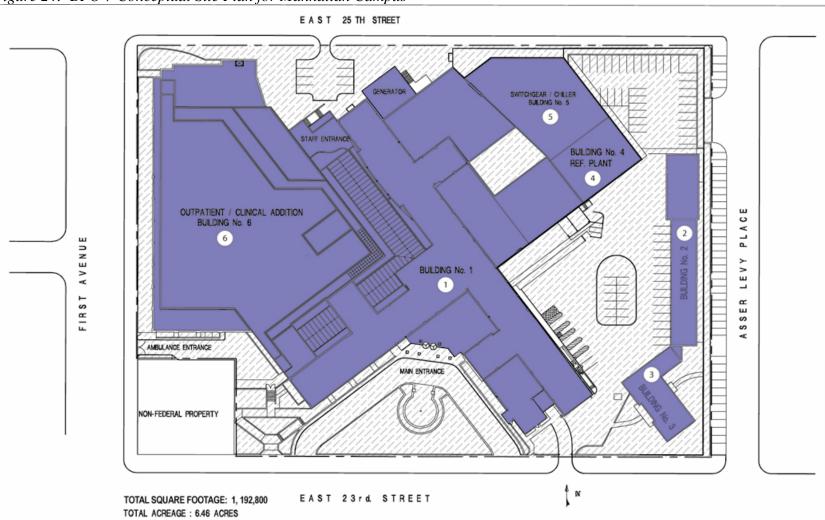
BPO 7 Conceptual Site Plan for Manhattan Campus
